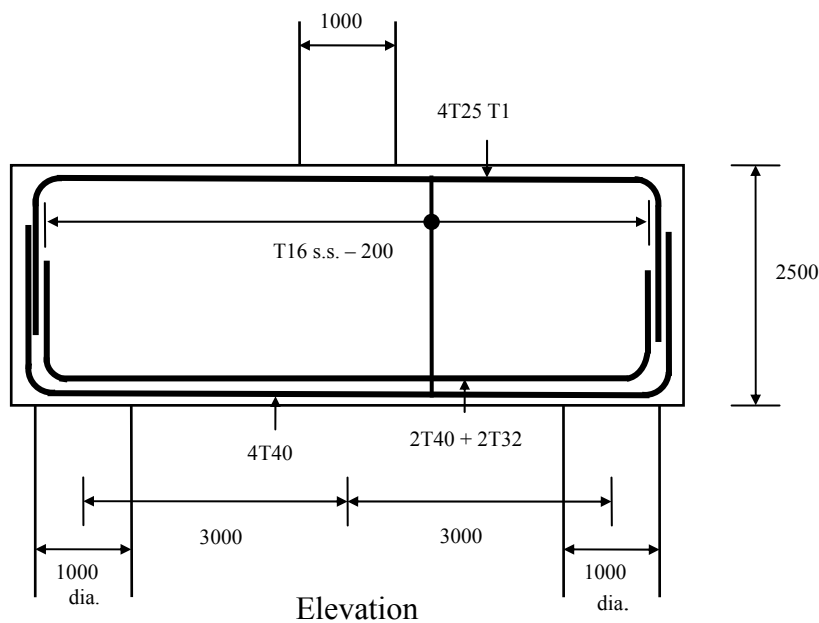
Reinforcement Details of Worked Example 12.2
